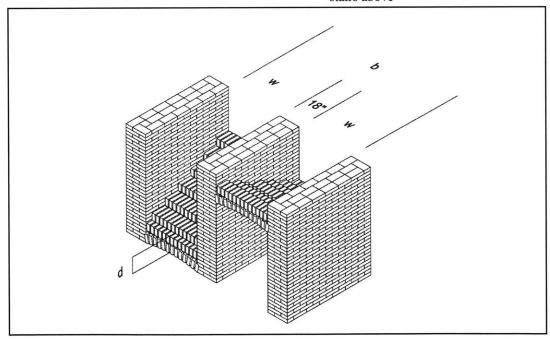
Stair detail showing supporting arches and bracing walls
